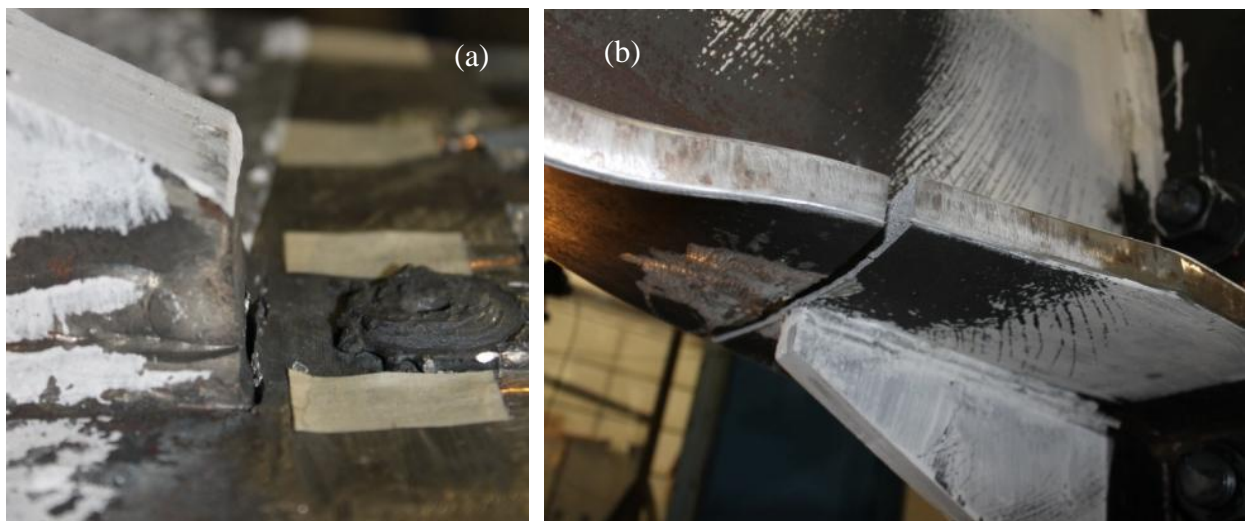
Cracks in Specimen 8 (W36x150 with RBS and Puddle Welds) Including (a) Initiation of Crack at Toe of Stiffener Weld to Top Flange and (b) Complete Fracture at the Bottom Flange at the Same Location
